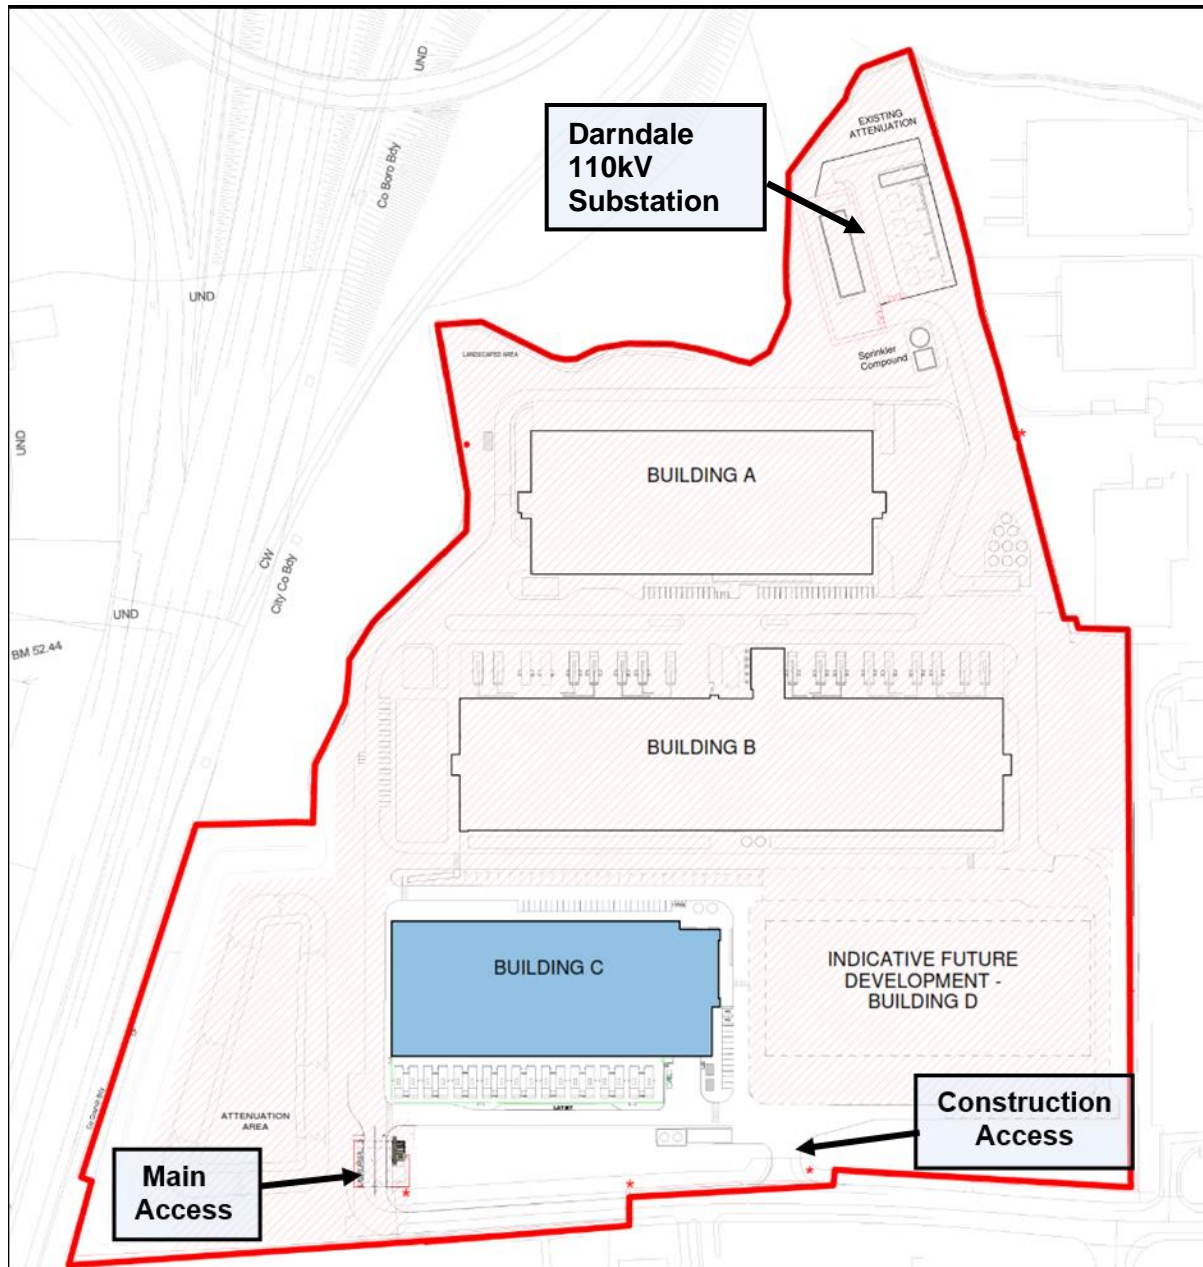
Proposed Site Layout showing Darndale 110kV Substation to the north of the site
